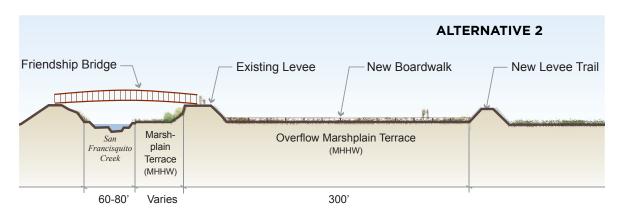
| CROSS SECTION E, VIEW LOOKING DOWNTREAM
